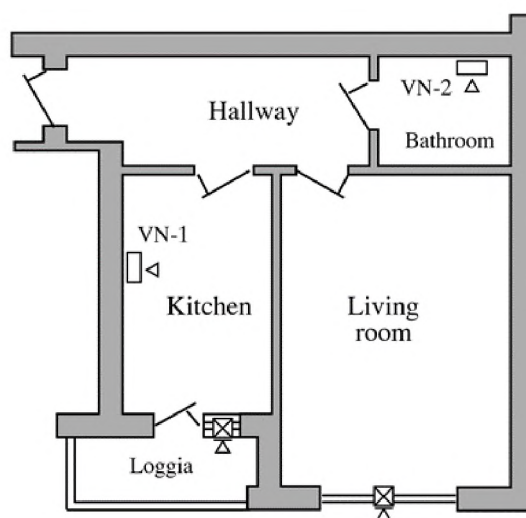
Schematic plan of an ordinary section of a multi-storey residential building
